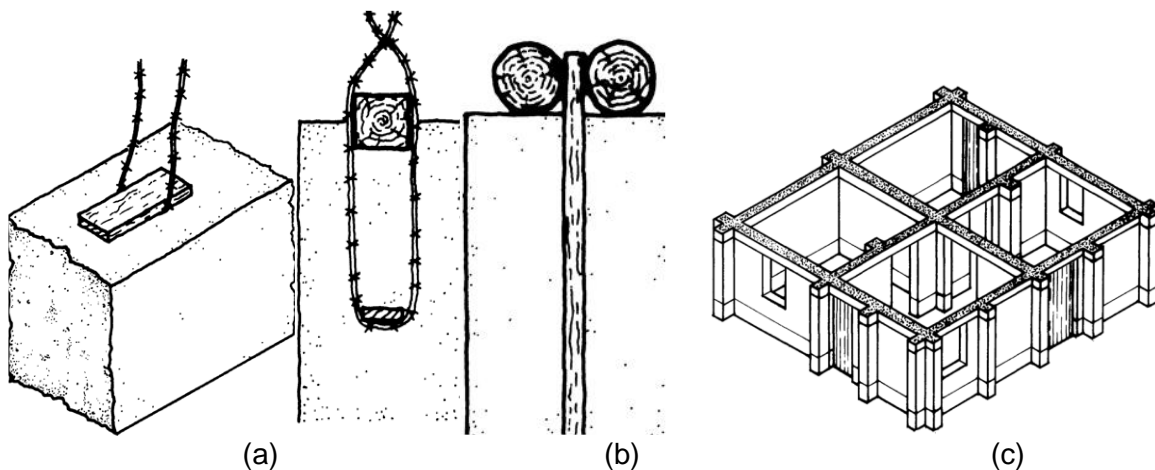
Possibilities of fixing wooden ring beams (a) wooden beams in RE wall; (b) vertical post fixed to a double ring beam in RE wall and (c) adobe walls reinforced by buttresses and ring beams on the top of the walls (Minke & Schmidt, 2015)
